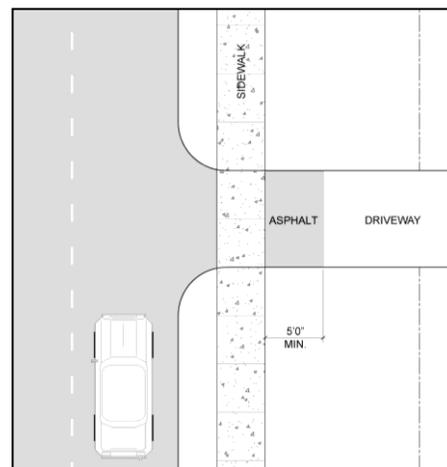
Gravel driveways should be paved from the road to at least five feet behind the sidewalk.
